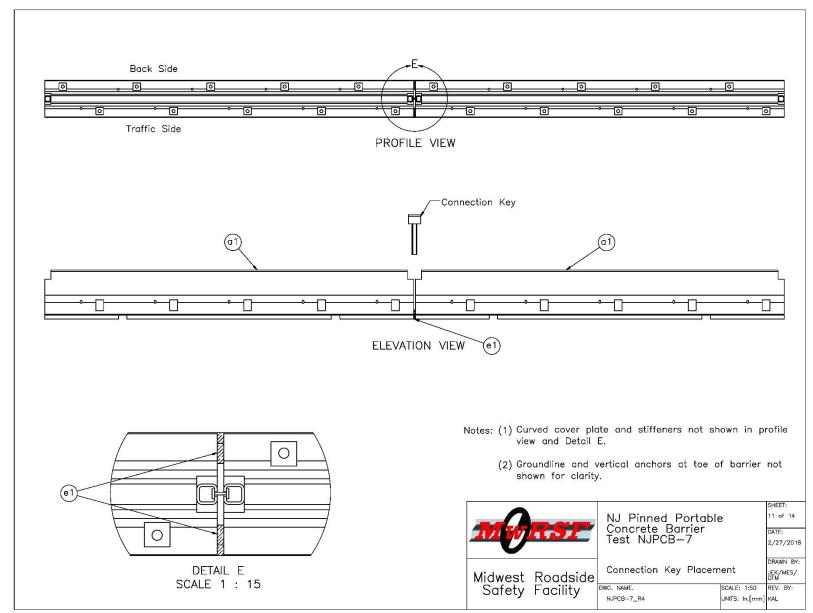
Connection Key Placement Details, Test No. NJPCB-7
